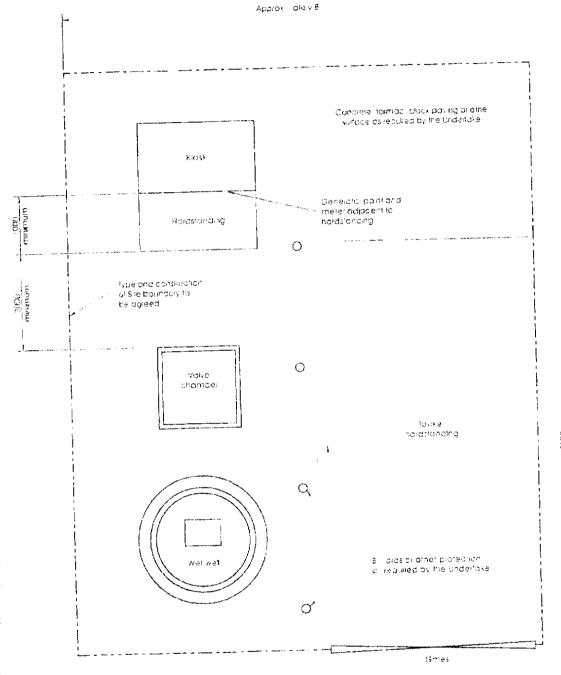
TYPICAL PUMPING STATION LAYOUT
